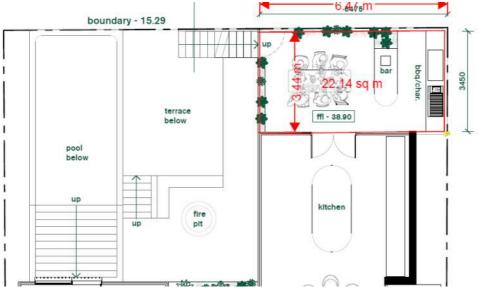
Extract from applicant's plans illustrating outdoor area on third level.
